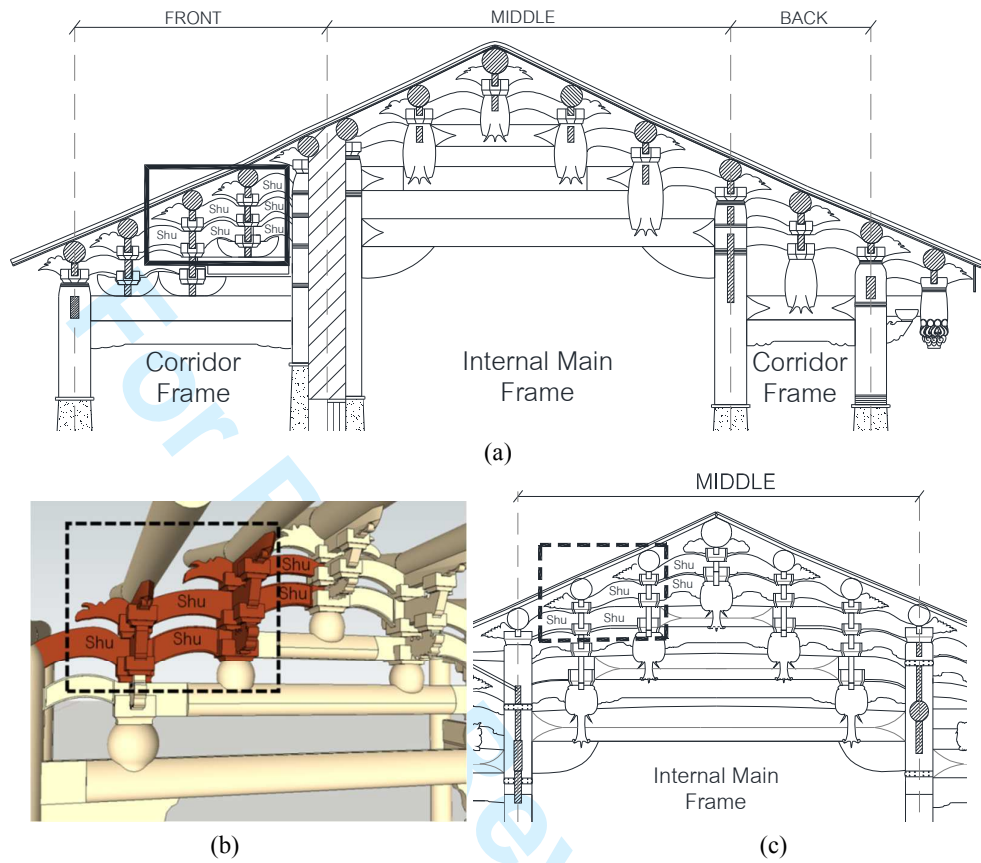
(a) Initial design of the prototype building: Entrance Hall of Chung Ancestral Hall; Internal main frame design of a typical Dieh-Dou Main hall of (b) Yuan-he Temple and (c) Jiang Ancestral Hall.
